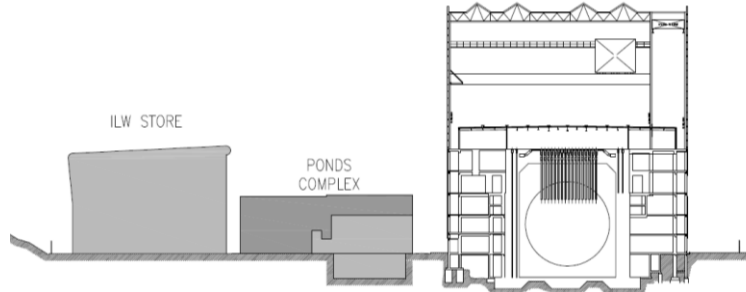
Cross section through RB1 and adjacent Ponds Complex
